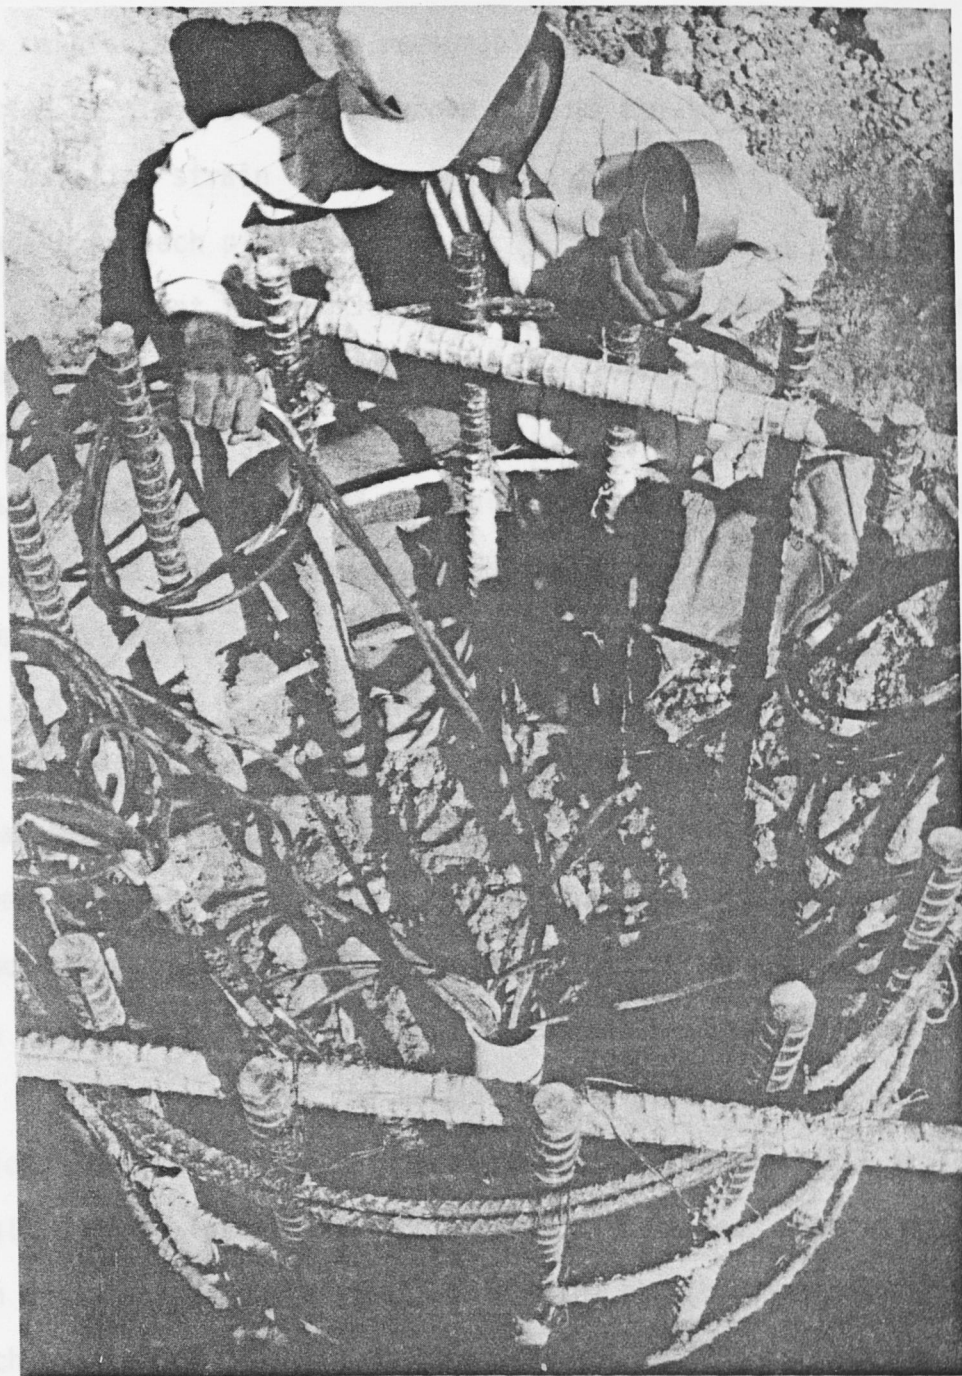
COMPLETED JOB OF INSTRUMENTATION ON PIER C-4
